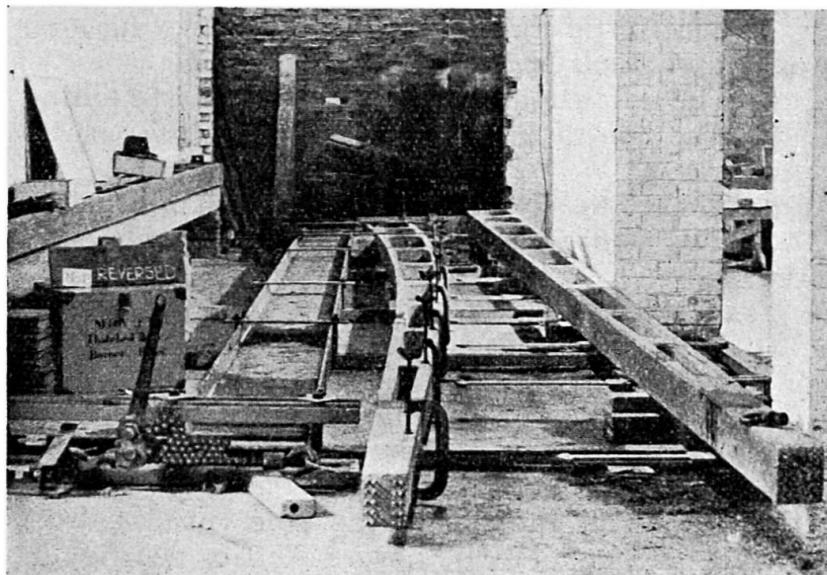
Prestressed concrete pole under test load 2 100 lb.
